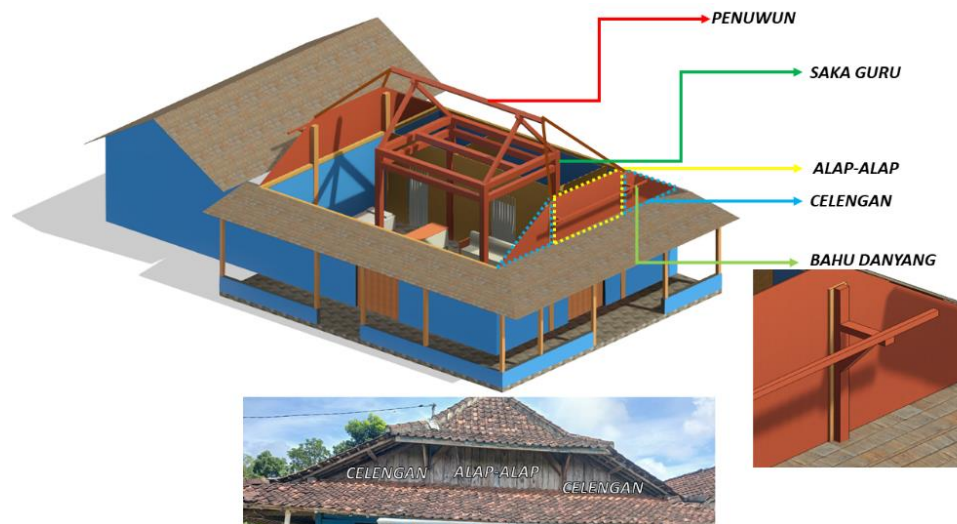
Detail of the roof structure and air circulation plane of the Sinom house.
